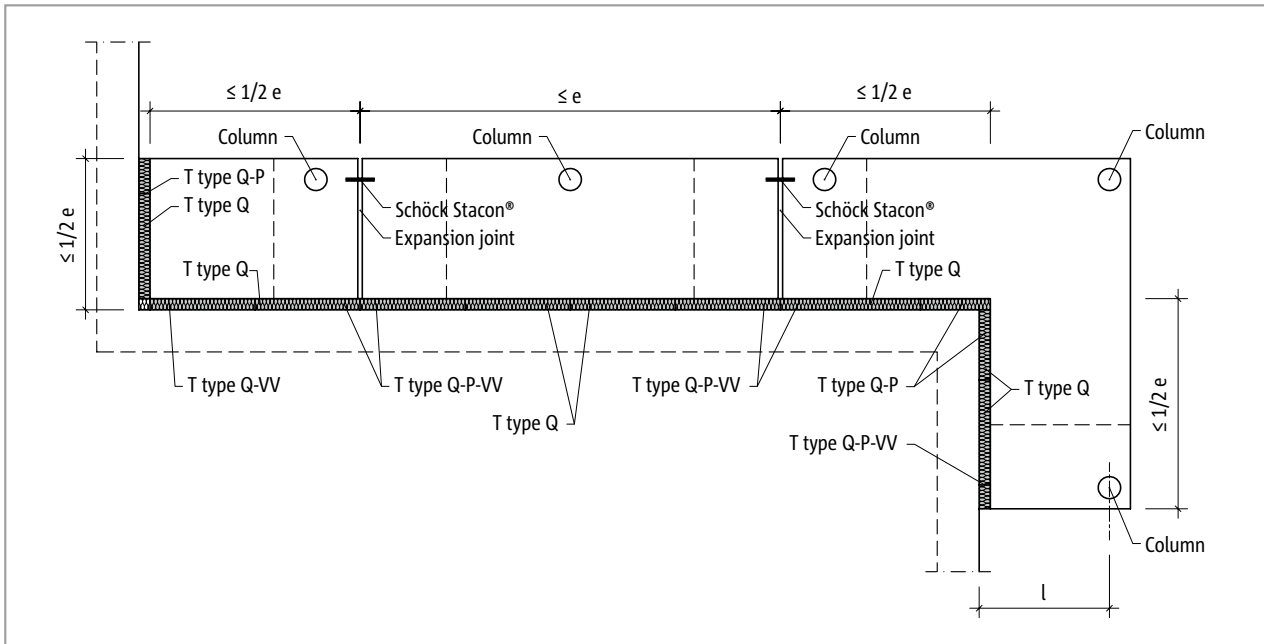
Schöck Isokorb® T type Q-P, Q-P-VV: Expansion joint layout
